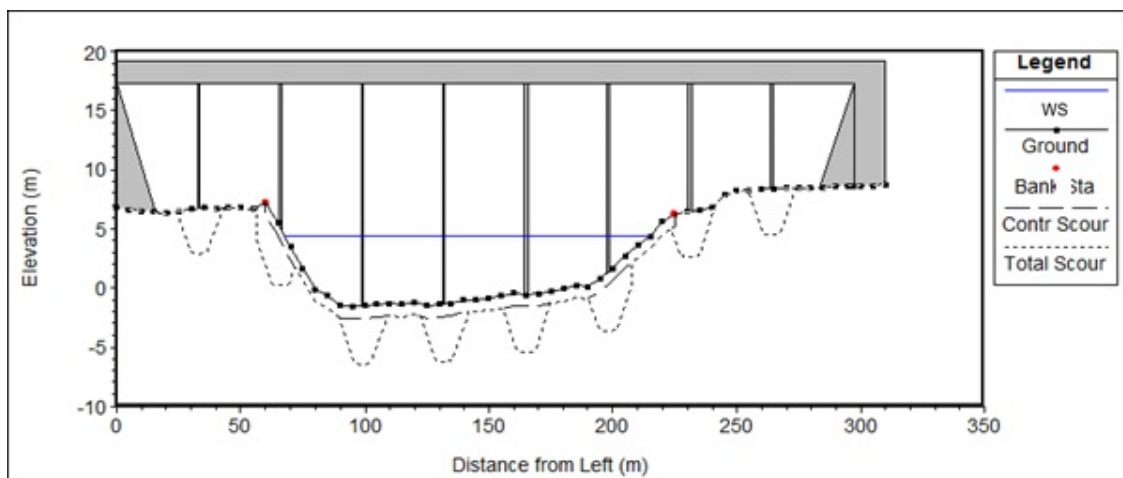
Variation of pier scour at the Manikganj Sadar Bridge under design condition with HEC-RAS model [the maximum local scour is found to be 3.38 m, with 1.5 m pier width, 16 October]
